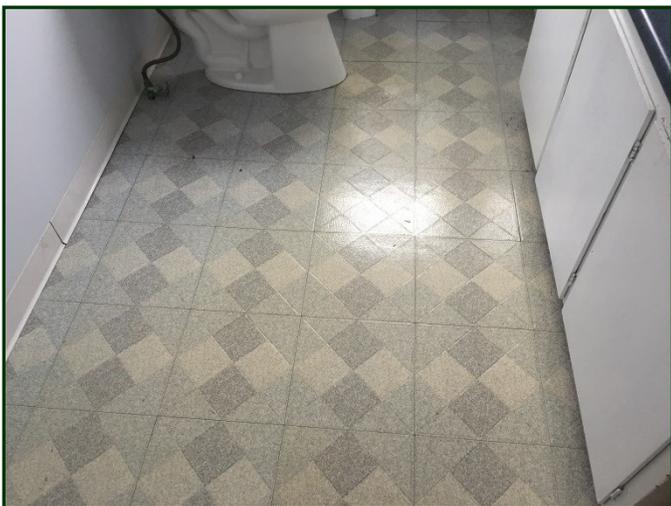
Photograph depicts general view of Sheet flooring within a Bathroom
